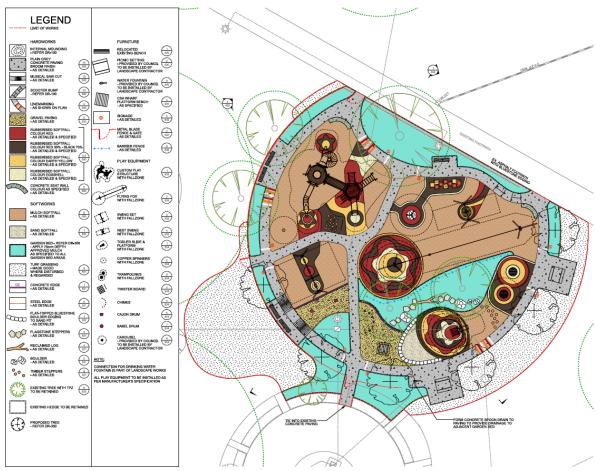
Colac Memorial Square Playspace Final Design (playspace layout)
